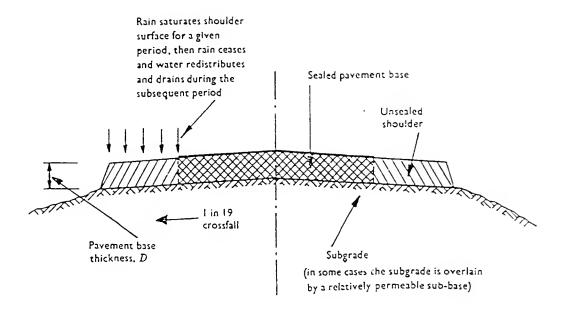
Pavement cross section for infiltration analysis (Wallace, 1975)
